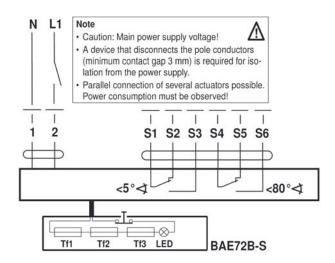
Wiring scheme of actuator BELIMO BF230-T
